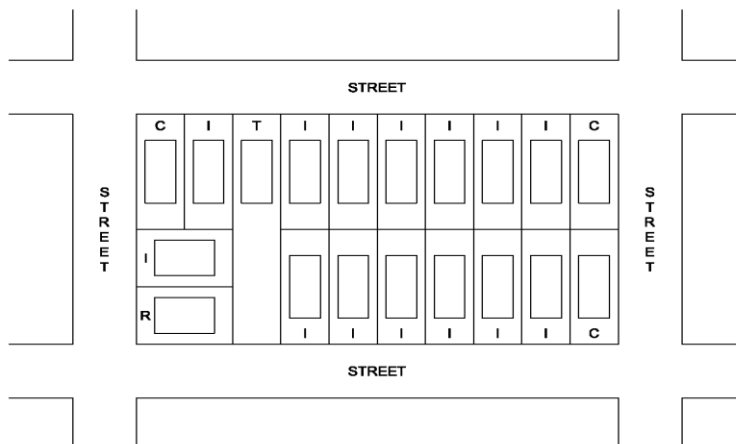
Site Types: (c) corner site, (I) interior site, (R) reverse corner site and (T) through site
